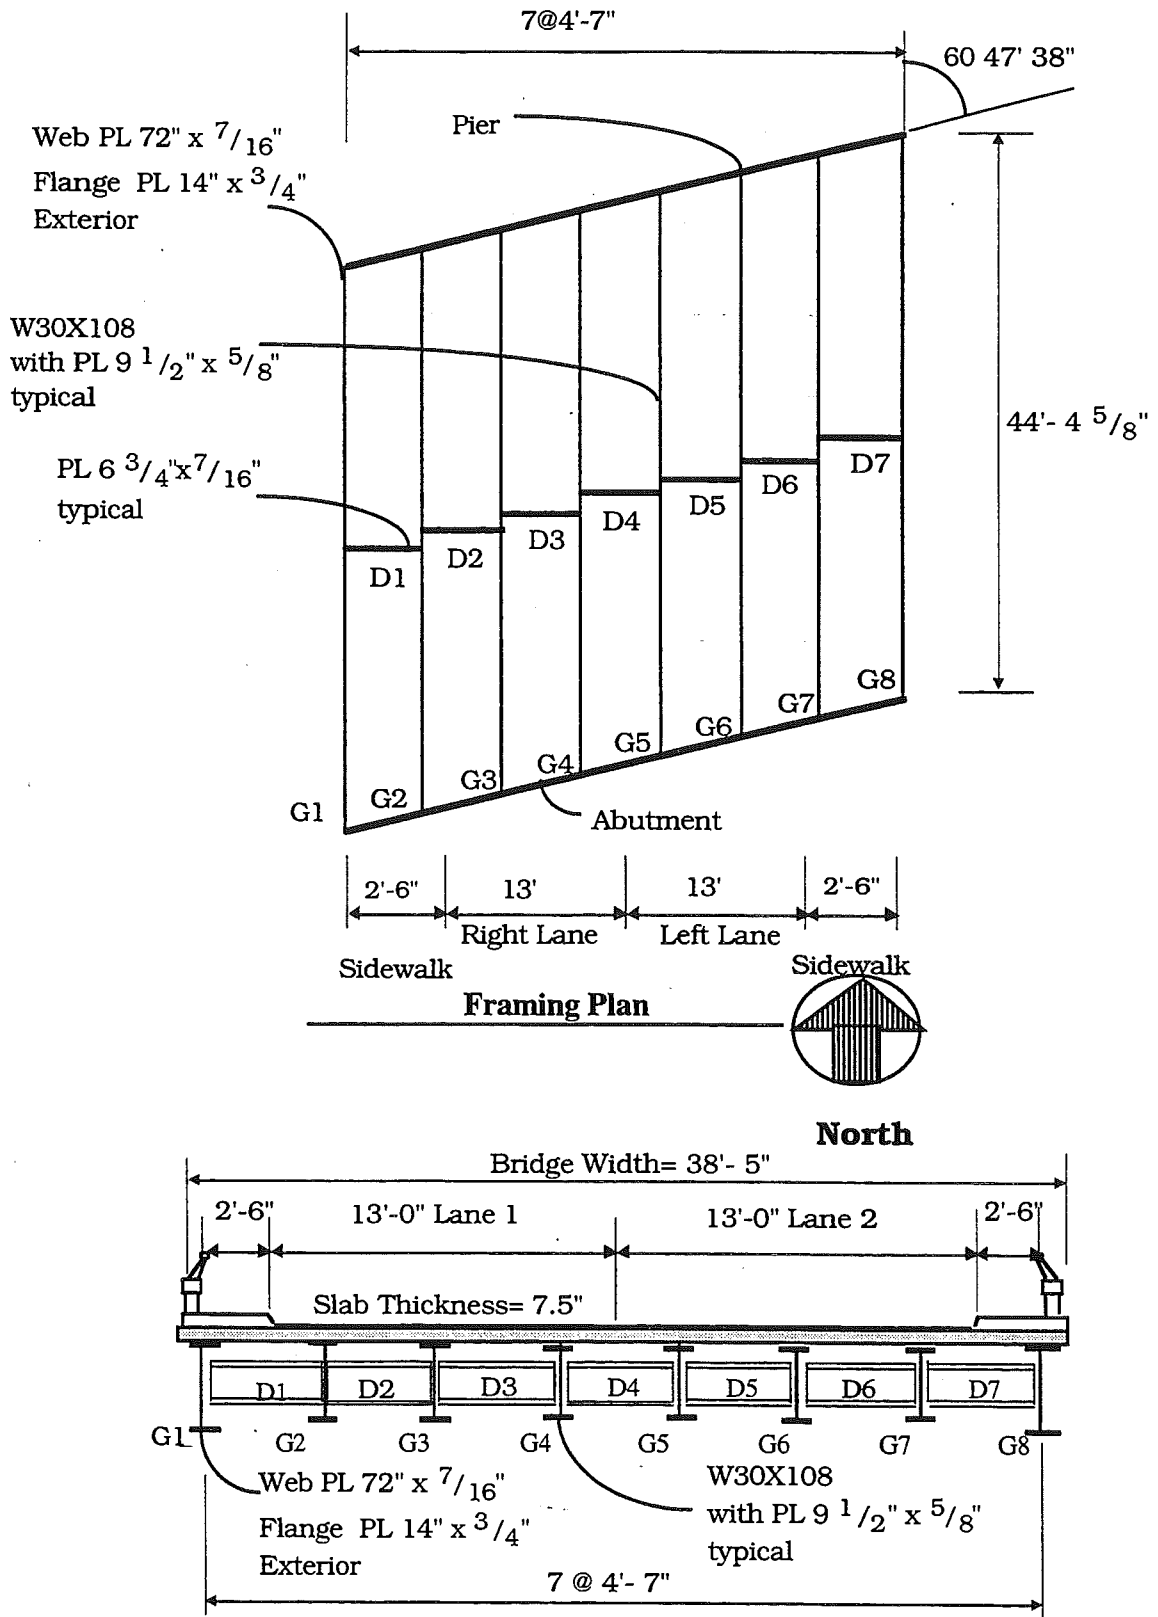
Bridge I94/I75, I-94 Westbound over I-75.
